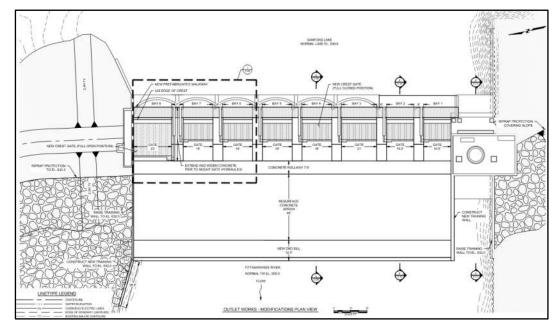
Plan View of Sanford Dam Primary Spillway Upgrades
